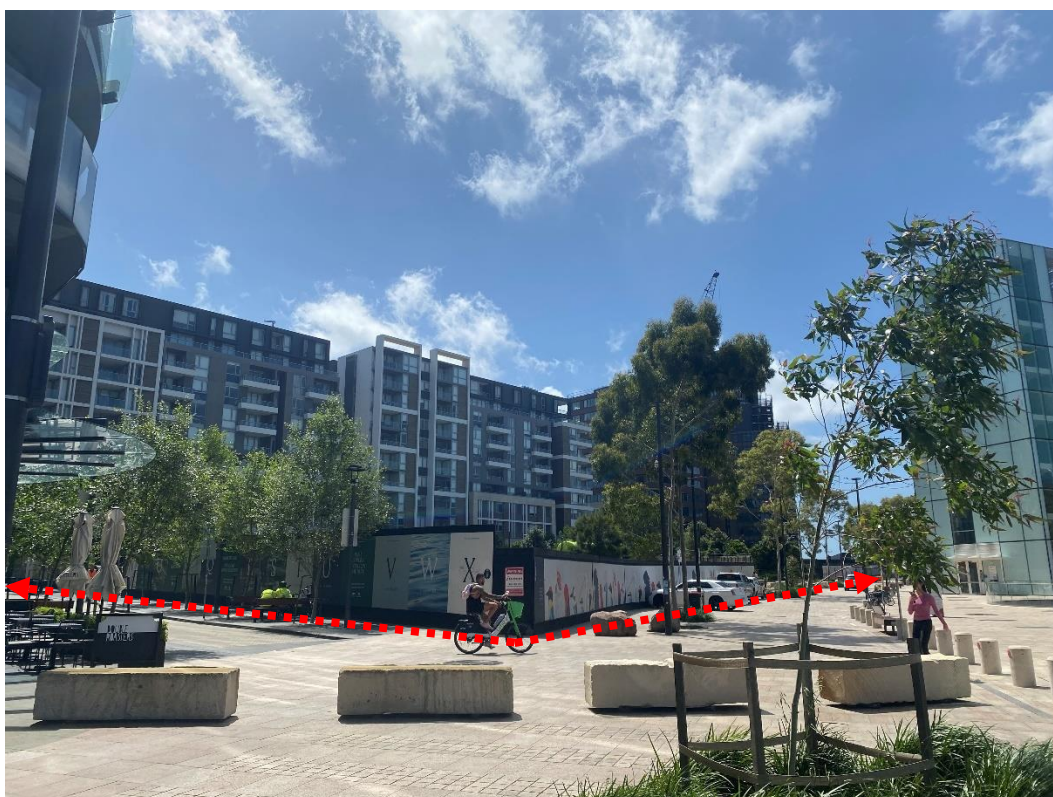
Site viewed from Green Square Plaza at Botany Road, looking east
